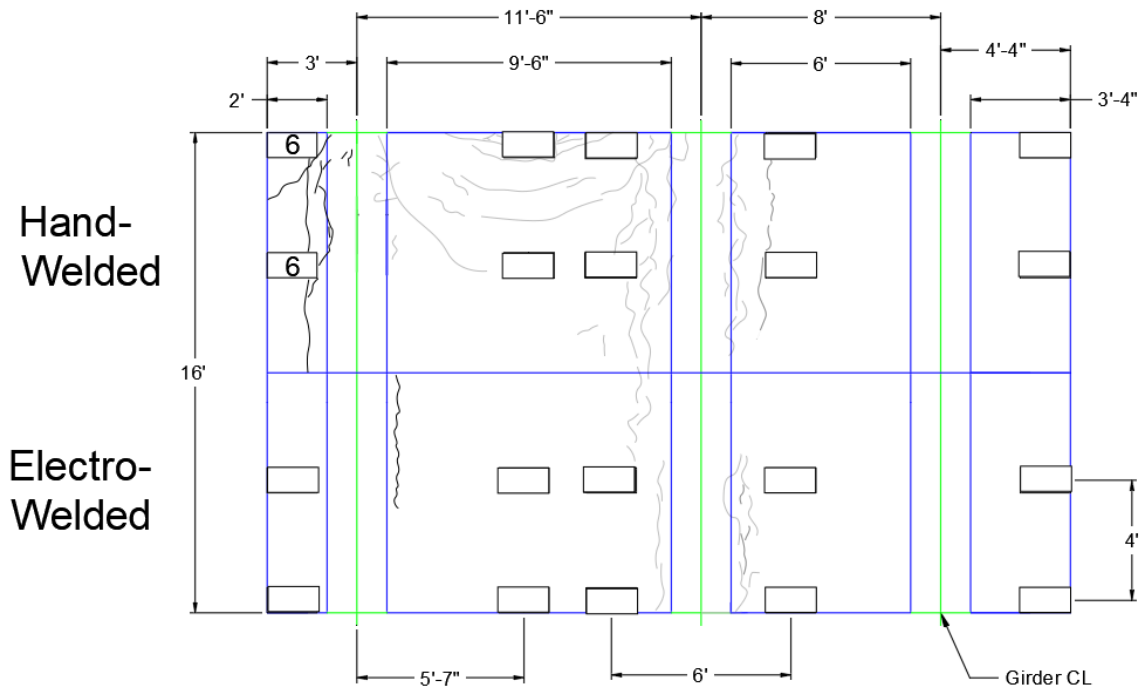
Crack Map - Test 6 - Hand-Welded - Short Overhang
